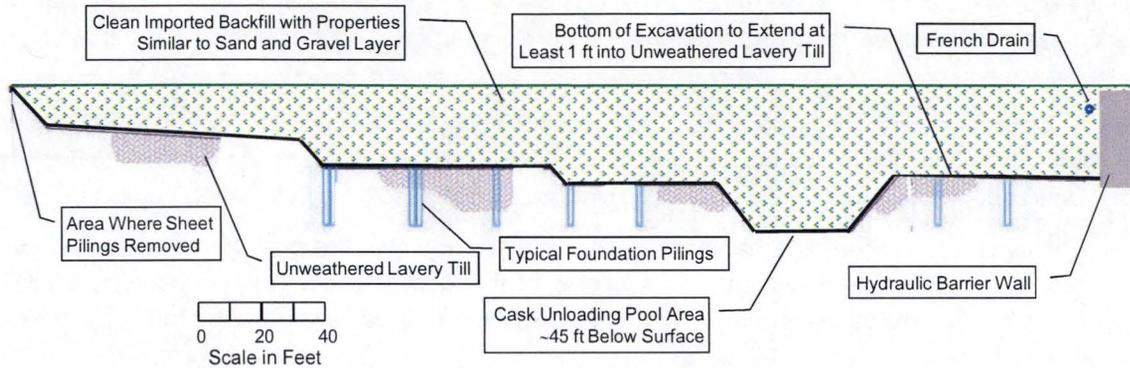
Conceptual Cross-Section View of the Backfilled WMA 1 Excavation
